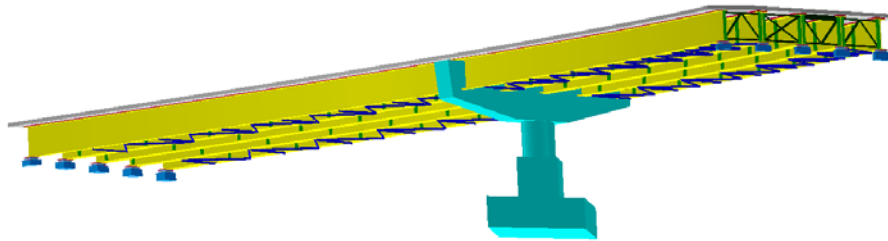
3D View of the Steel Case Study Bridge 2
